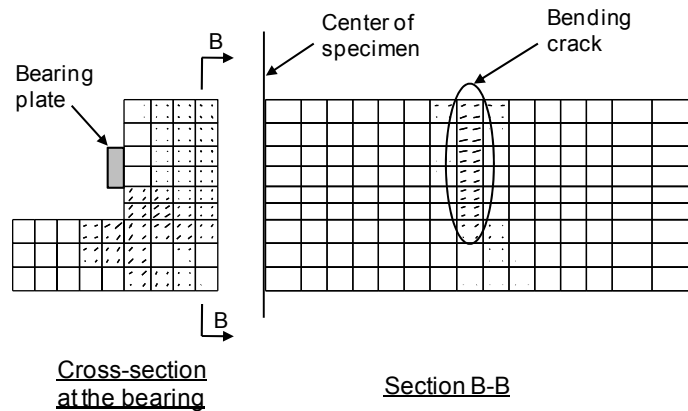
Crack initiation in specimen S1 for 50 kip (222 kN) bearing load.
